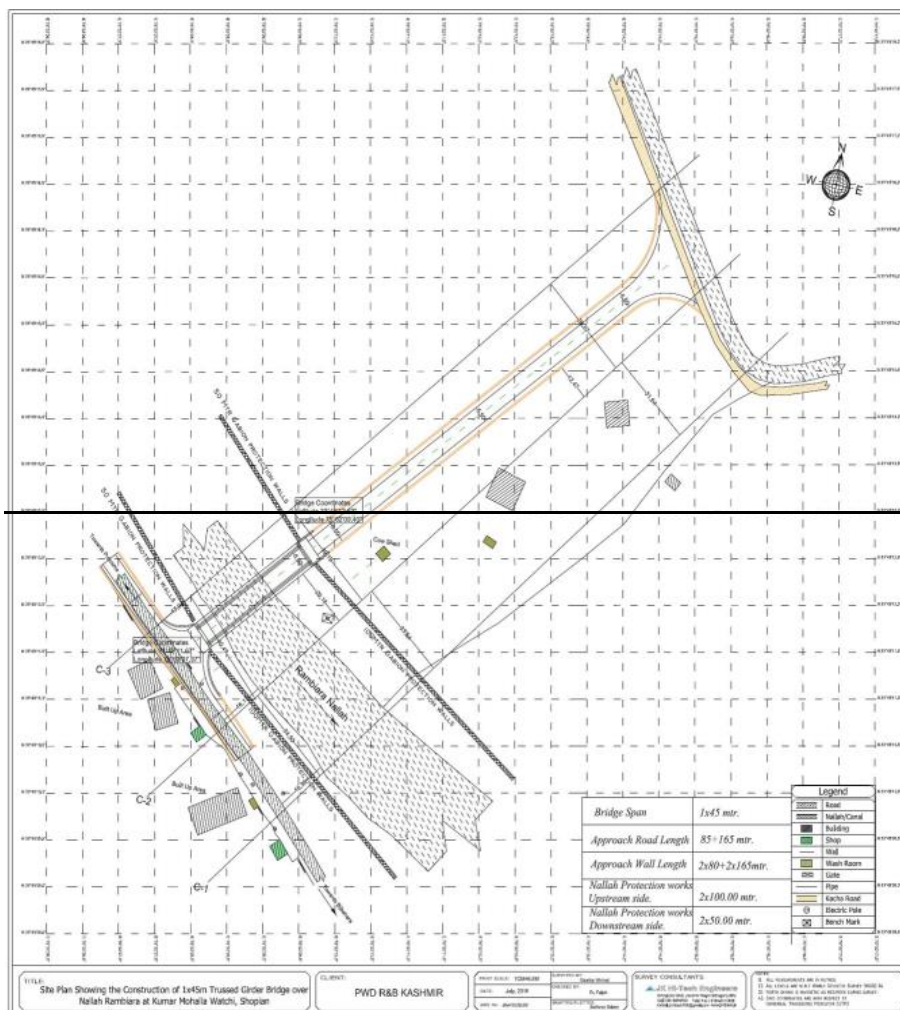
Plan and Profile of the Wachi Bridge and its Approach Roads on both sides
